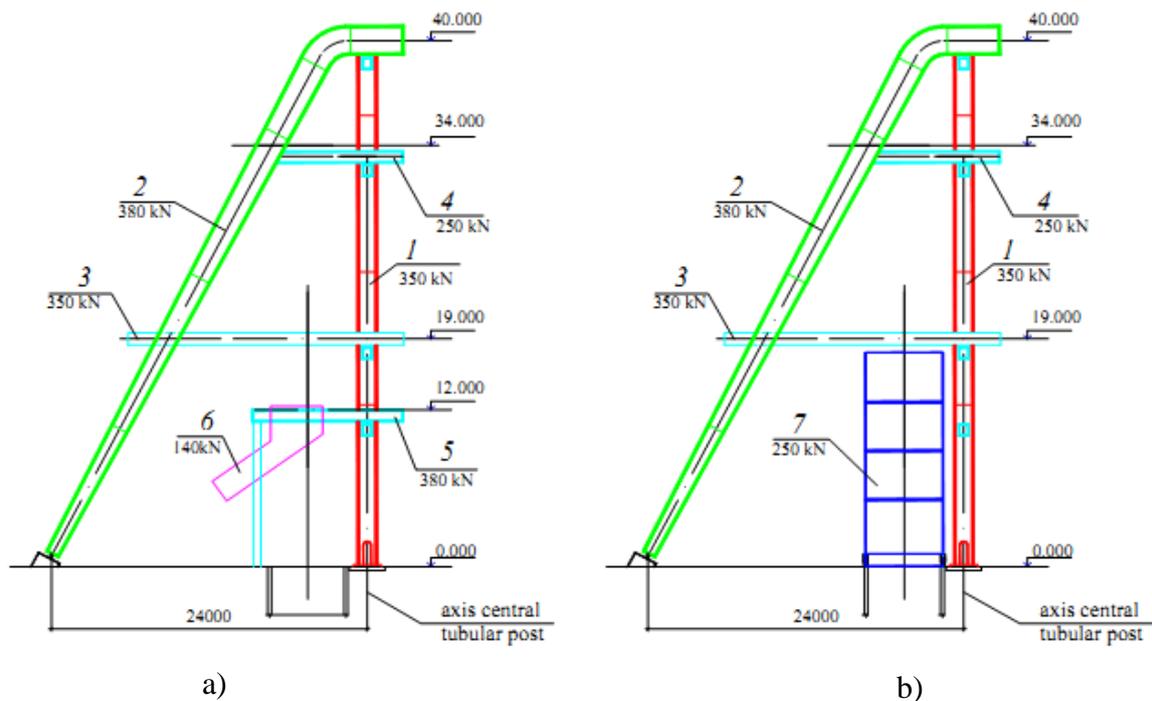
Breakdown of the headgear on blocks: a – scheme for sinking period; b – scheme for operation; 1 – central tubular post; 2 – stay leg; 3 – sheave wheels platform; 4 – permanent sheave wheels platform; 5 – unloading machine; 6 – reception bunker; 7 – rig
